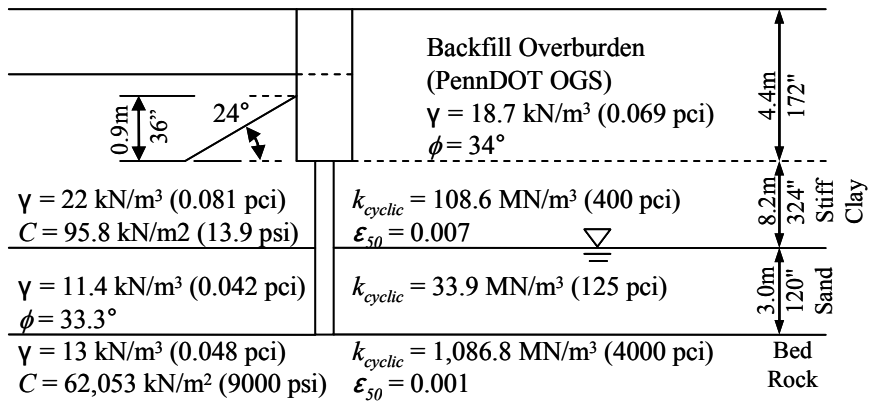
Bridge 211 Soil Properties under Abutment 1
